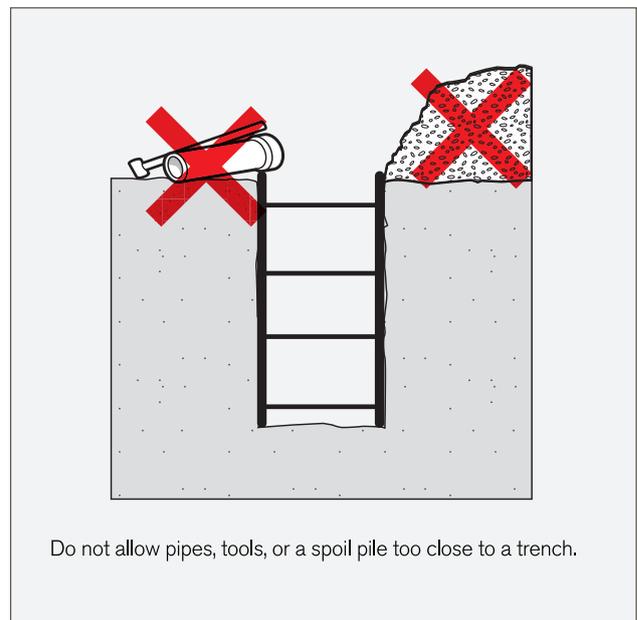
An example of a spoil pile and equipment being too close to the edge of an excavation
